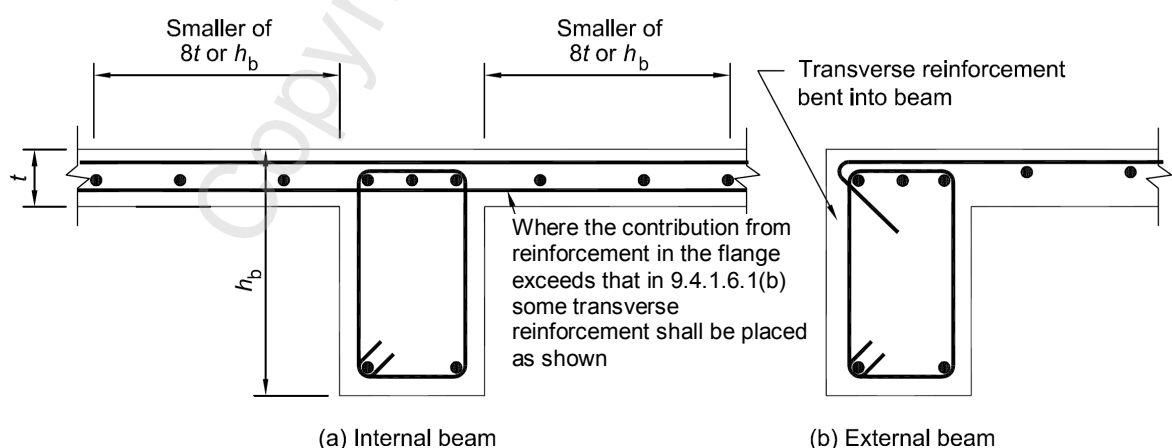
Effective reinforcement providing slab shear connection to beam
